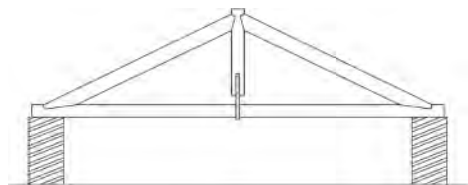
Schematic rendering of the *capriata* roof construction (drawing by Ho Kim).
